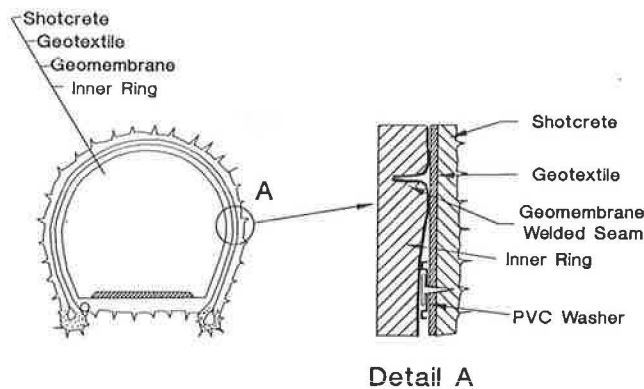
Section through a typical NATM design showing the various components of the structural and waterproofing system.
